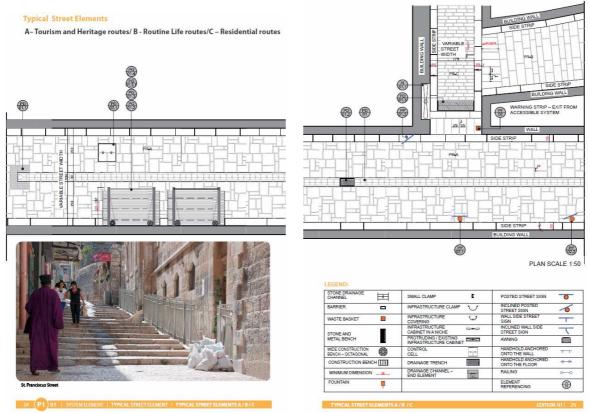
An example for typical street element – plan and photo before renovation presenting the problem
